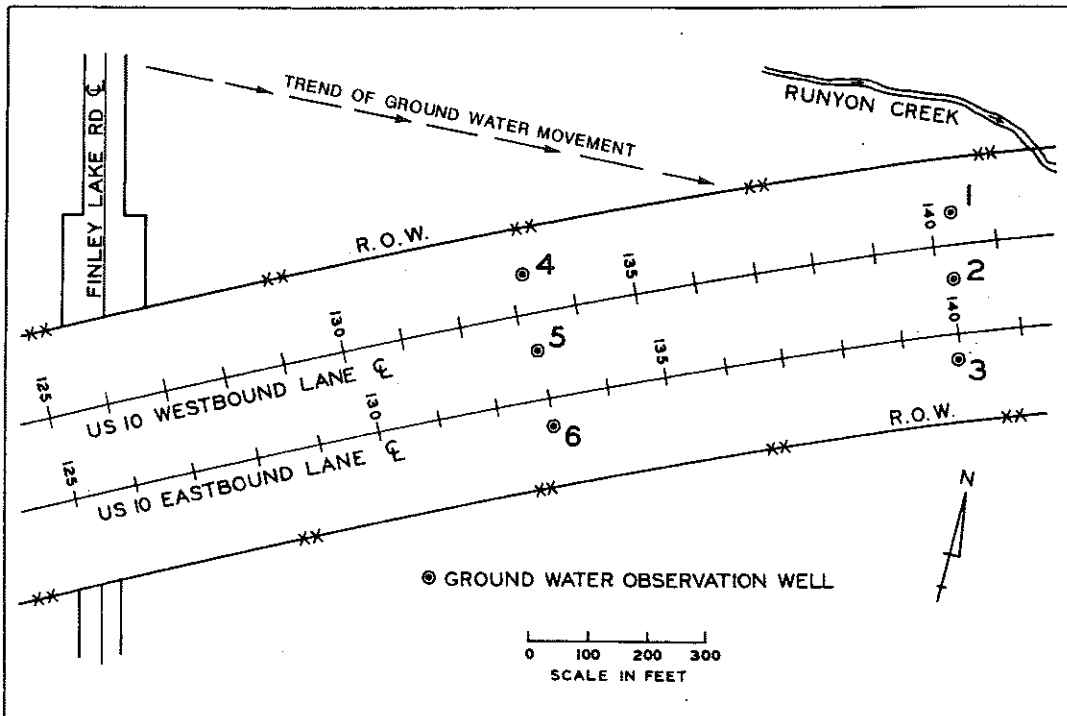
US 10 well locations: US 10, Finley Lake Rd Area (Section 14, T17N-R5W, Surrey Twp, Clare Co.). Roadway opened to traffic in 1975.
